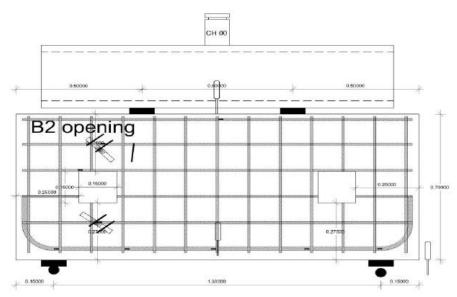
Geometry, Loading, and Reinforcement of Beam (B2) Tested in laboratory
